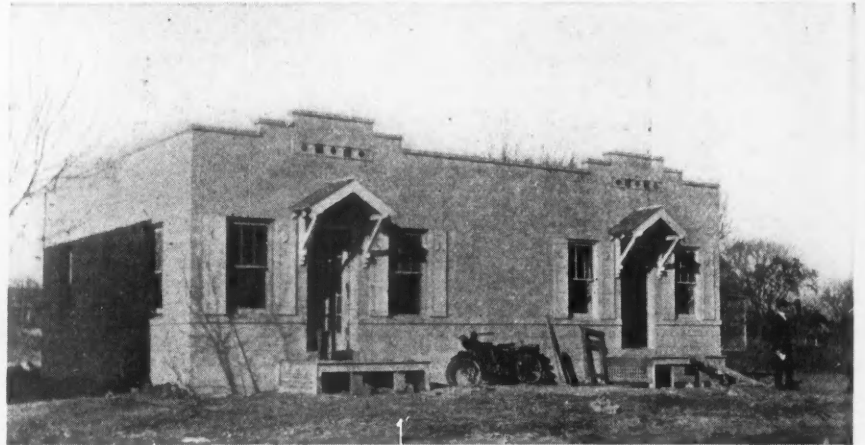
A Two-Family Drake House in Omaha, Built of Granite-Faced Concrete Block. The Small Ornaments Above the Entranceways Are Terra Cotta Inserts. On the Exterior of This Building Porches Remain to Be Completed and Trellises Set in Place Between Front and Side Windows.
